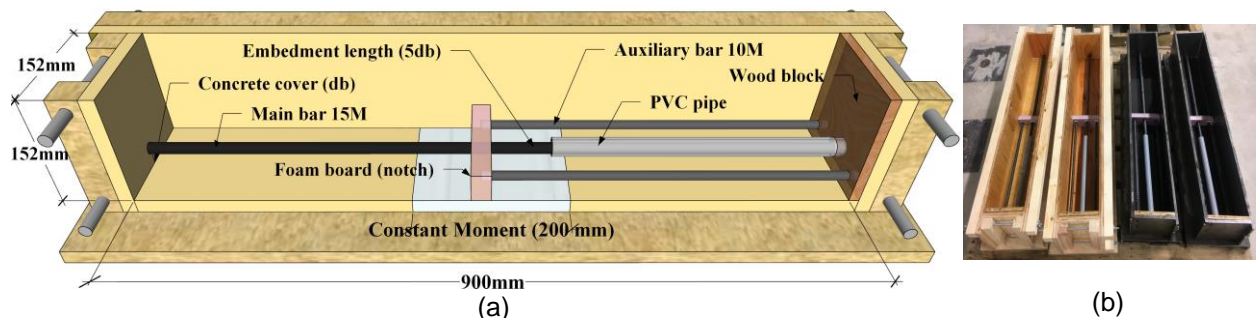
(a) Beam setup detailing and (b) prepared formwork
